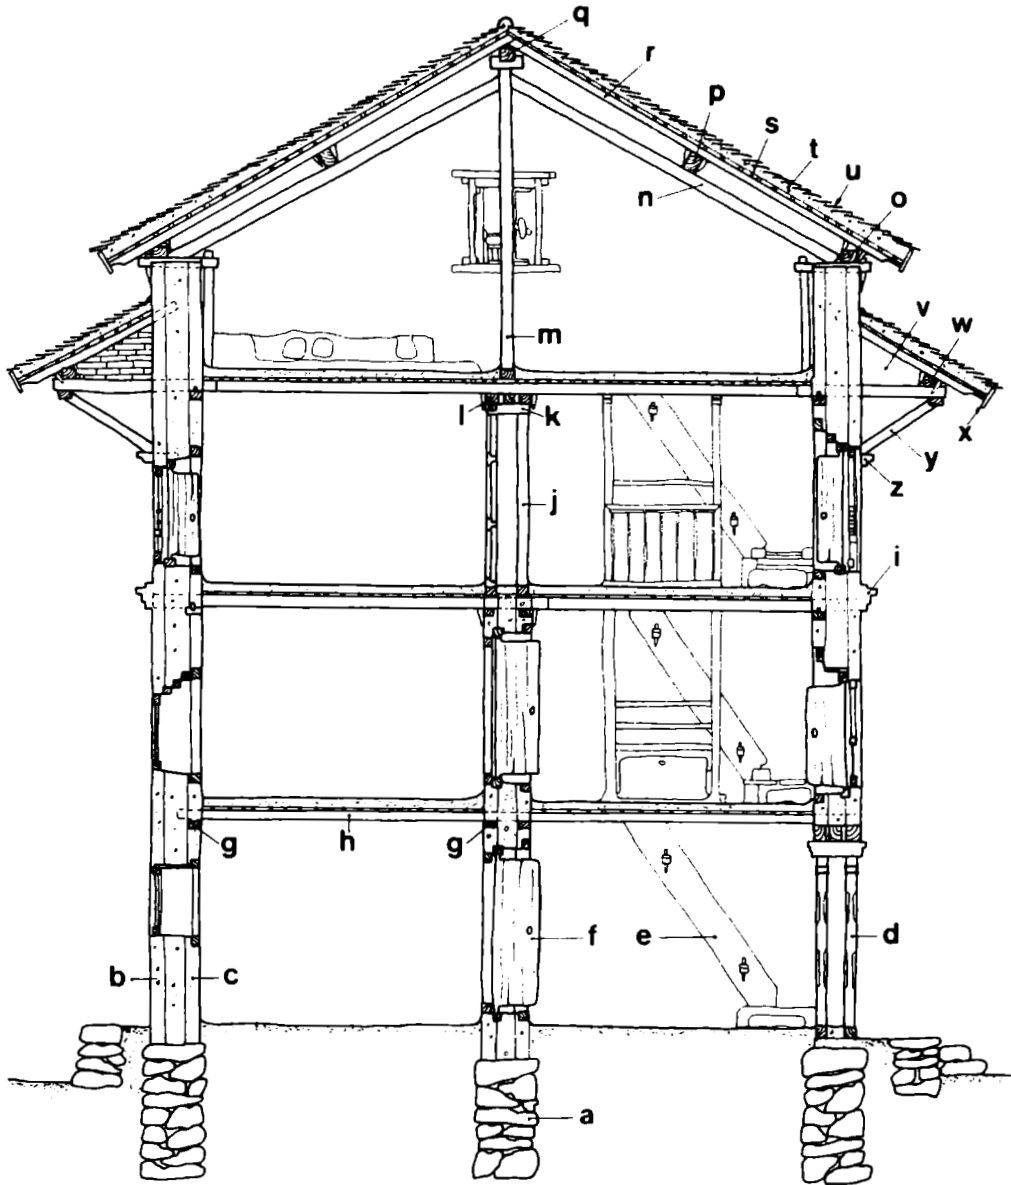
Section showing the various elements of the dwelling unit. a : foundation; b : external face of backed brick walls; c : internal face (and internal partition wall) in unbaked bricks; d : portico; e : staircase; f : door; g : girders; h : joist; i : decorative frieze or clamping; j : column; k : abacus; l : beam; m : frame pole; n : roof rafter; o : wall plate; p : purlin; q : ridge pole; r : rafter; s : lath; t : masoned earth; u : tile; v : eaves; w : wall plate; x : string-course; y : bonds supporting the eaves; z : bracket (V. Barre, P. and L. Berger and G. Toffin, 1980).
